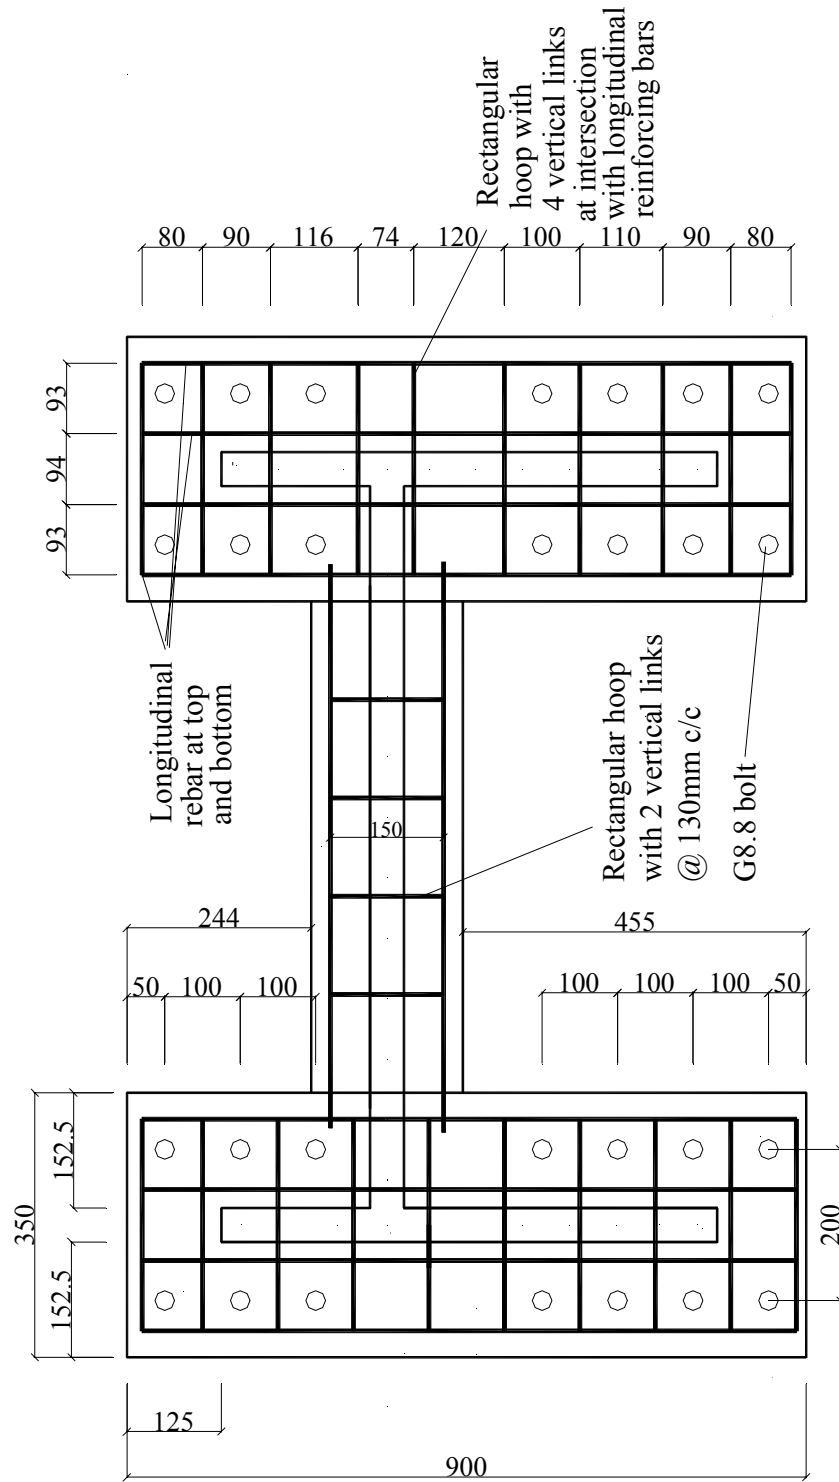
Details of reinforcing bars in the base block reinforcing bars
